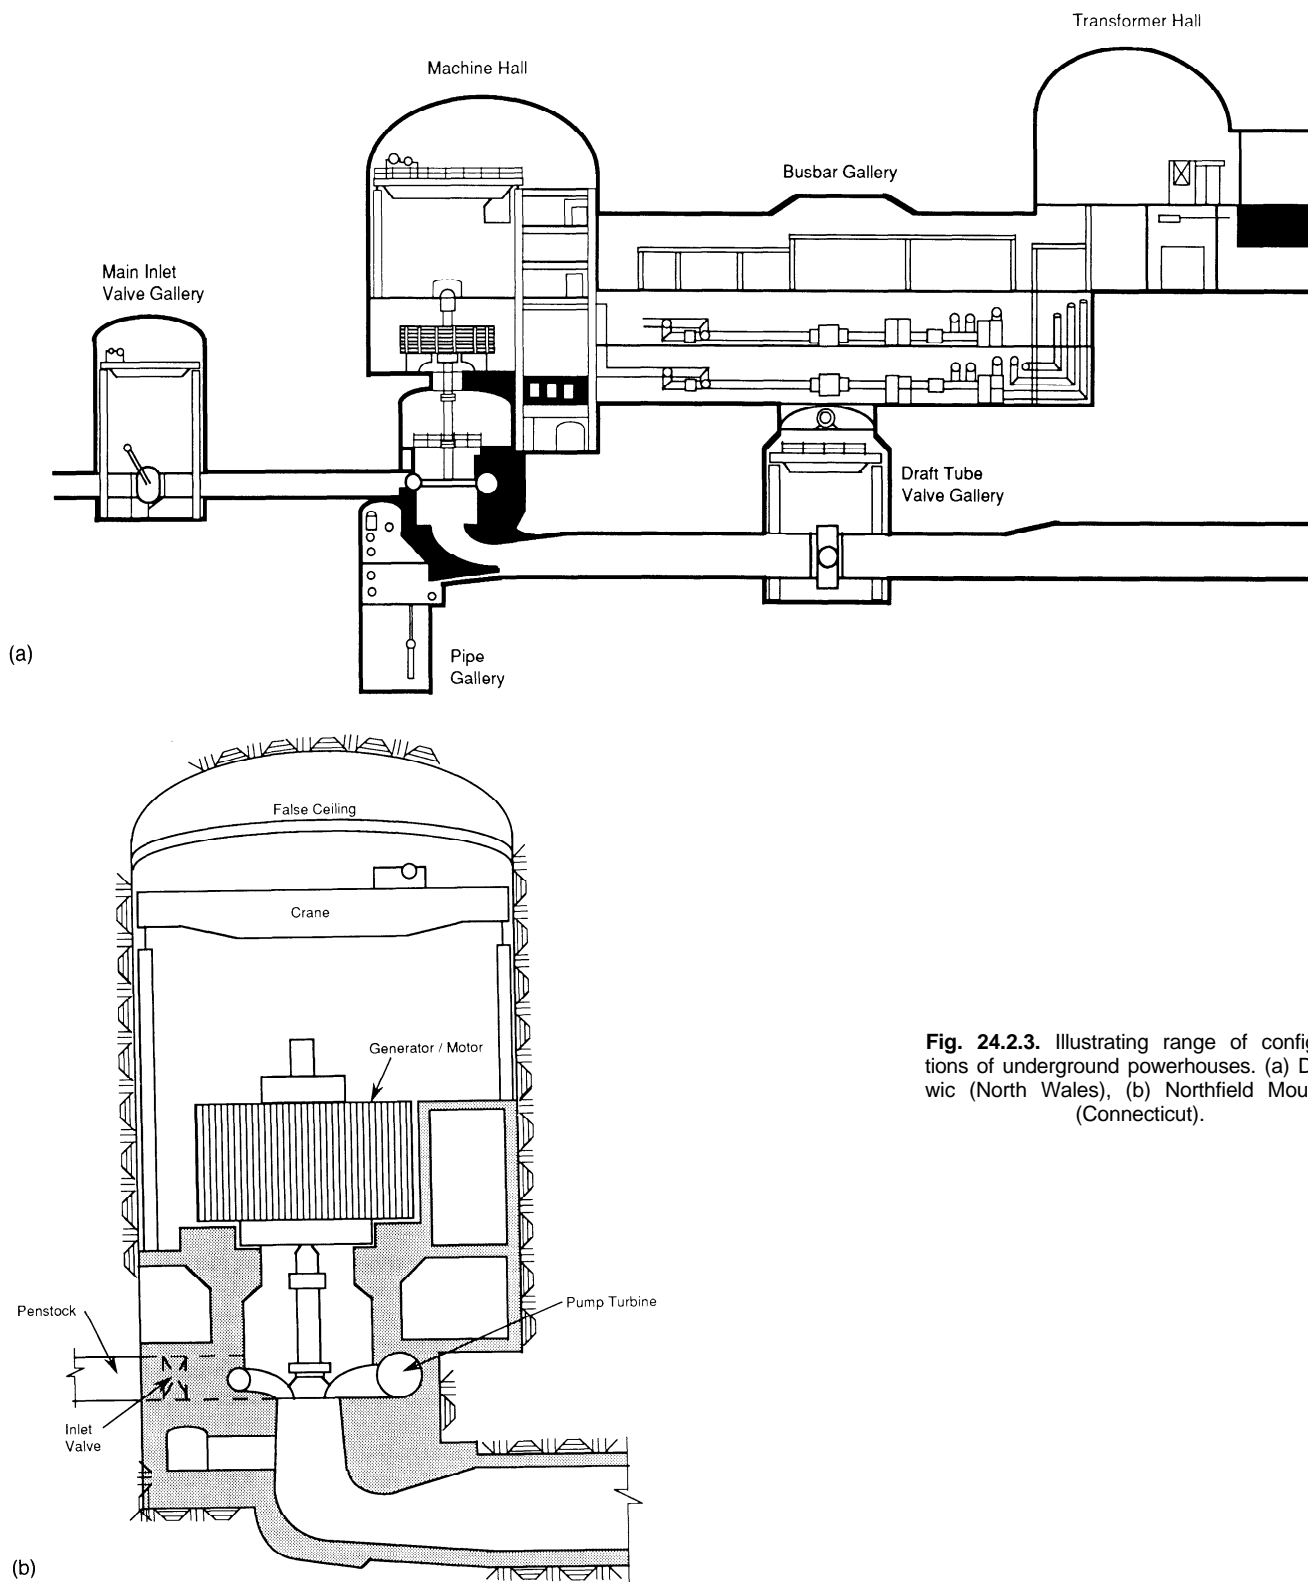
Illustrating range of configurations of underground powerhouses. (a) Dinorwic (North Wales), (b) Northfield Mountain (Connecticut).
